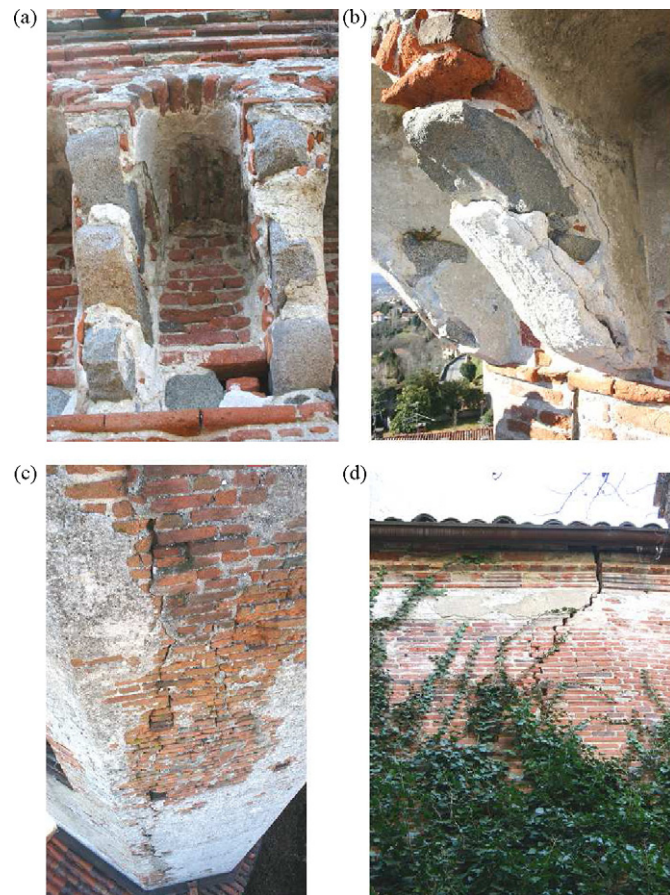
Crowning of the Tower La Marmora Masserano: (a–b) details of the damage phenomena; (c) Cracks on the North-east wall; (d) Cracks on the North wall of the tower.
